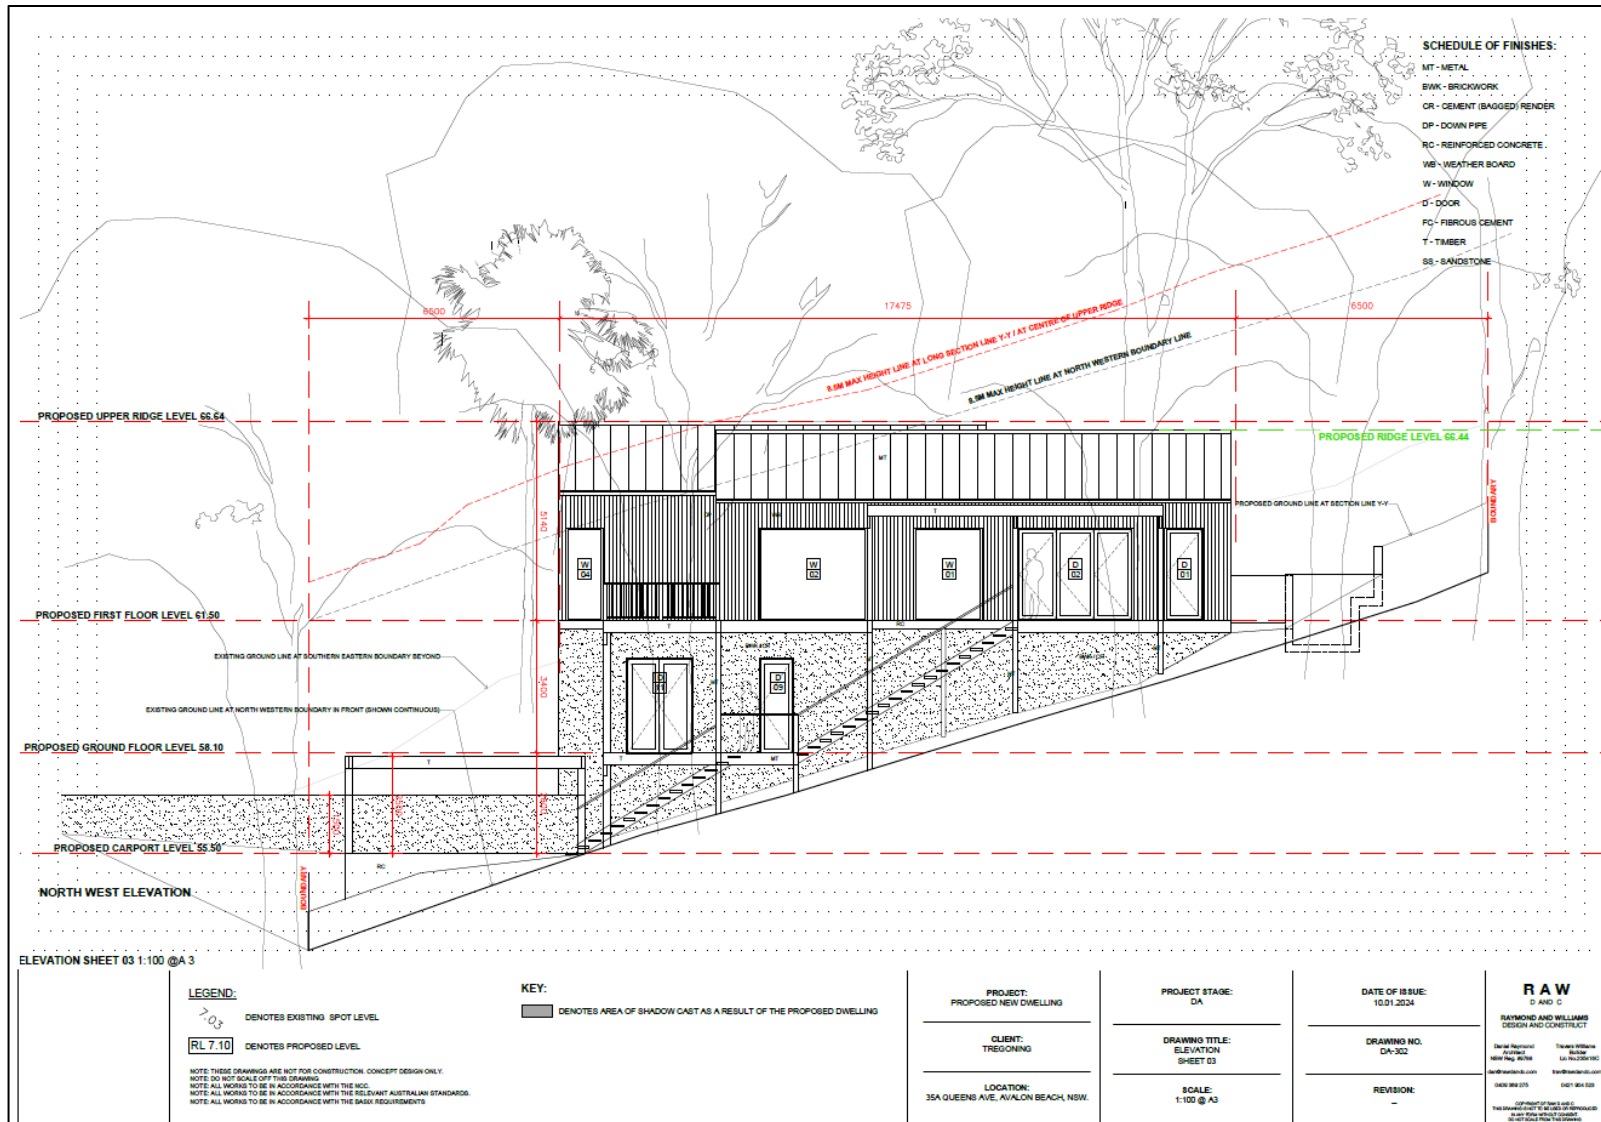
ILLUSTRATES PROPOSED NORTHWEST ELEVATION
